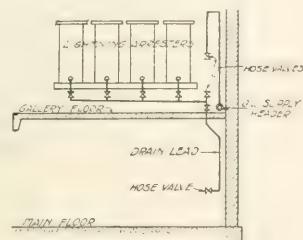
OIL PIPING TO LIGHTNING ARRESTERS
